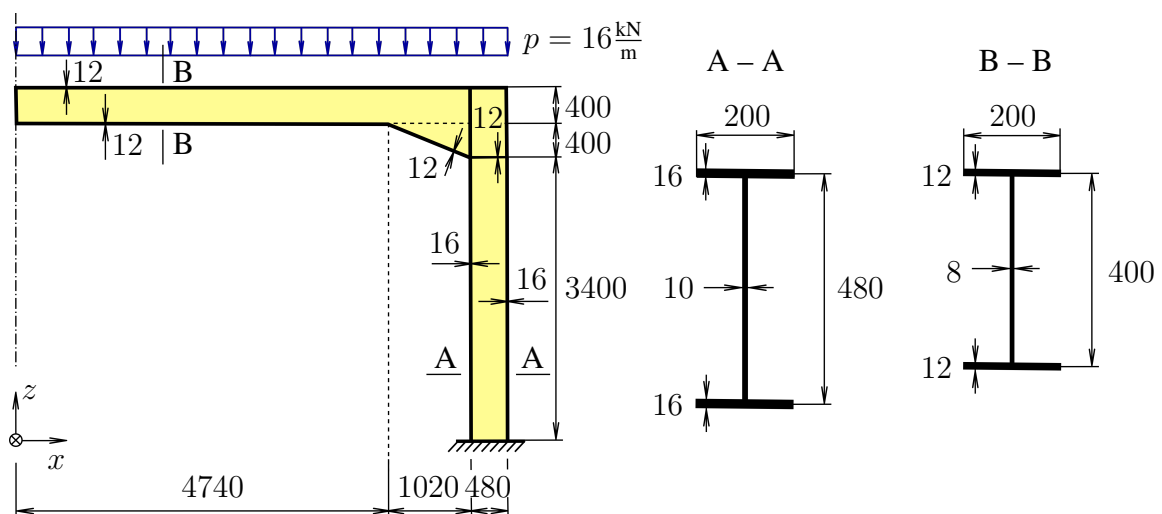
Steel frame structure – problem sketch. Half of the structure is modeled due to symmetry
